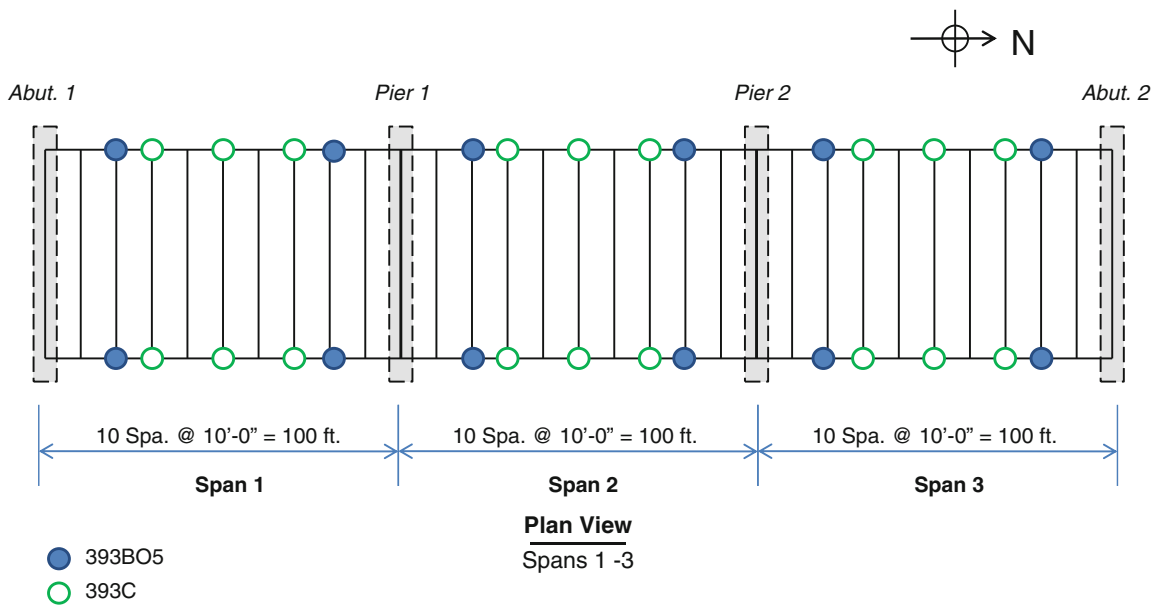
Accelerometer layout for all truss spans – Setup 2
